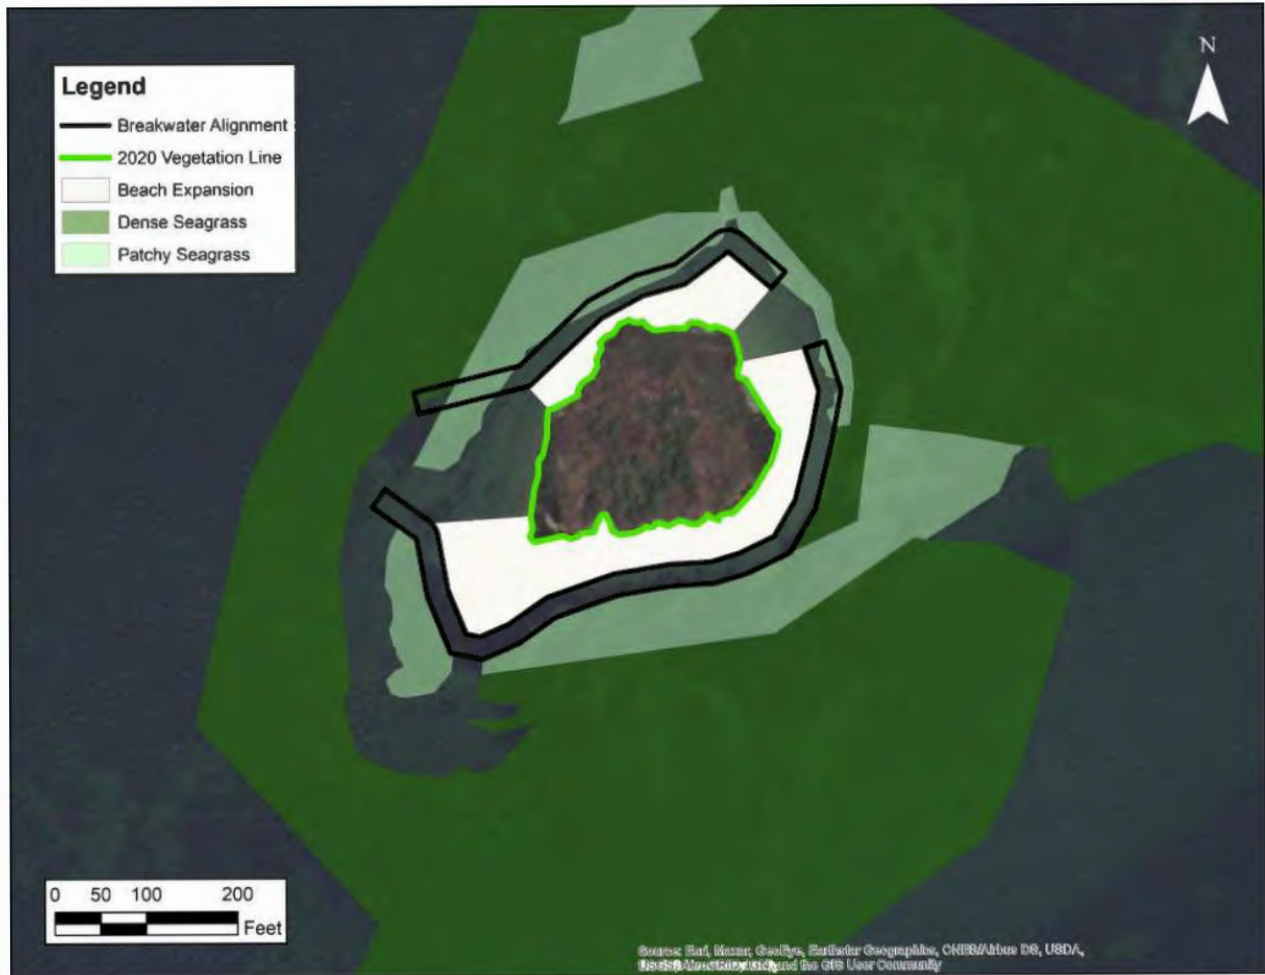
Plan view of Alternative 2: riprap breakwater with beach expansion
